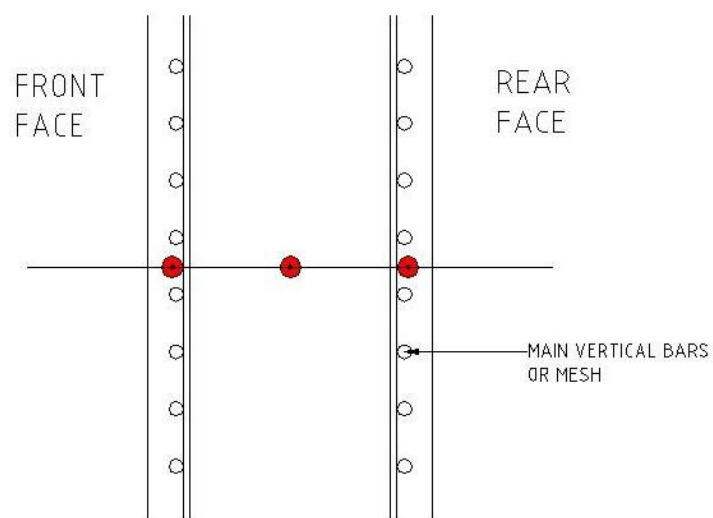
A horizontal section through a concrete wall in which strain gauges are positioned to measure bending of the wall.
